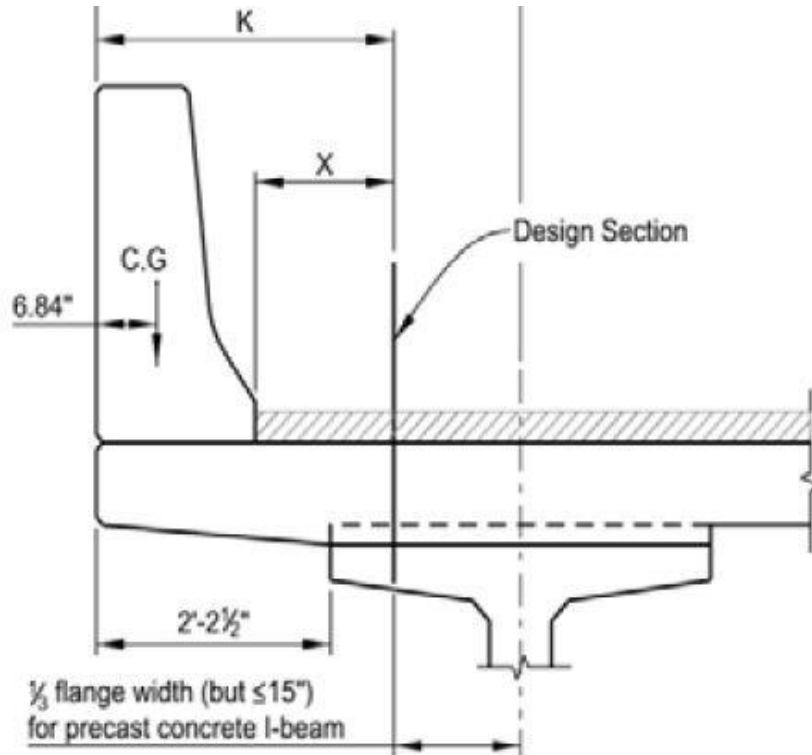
1/3 Flange Width or 15-in. Wide Design Section for Prestressed Concrete Girders [41]
